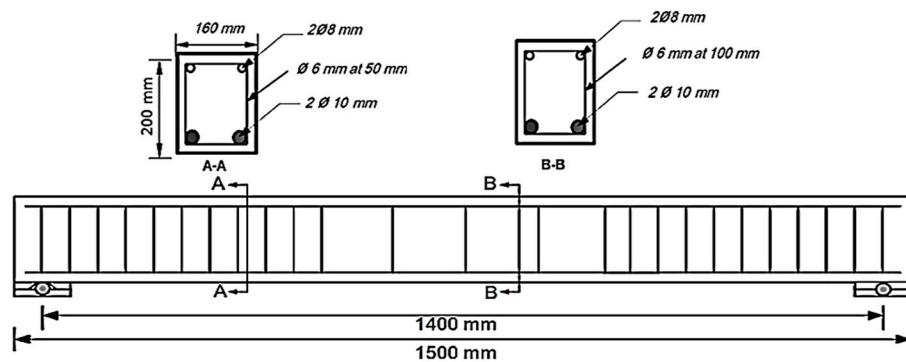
Concrete geometry and reinforcement details of tested specimen.
